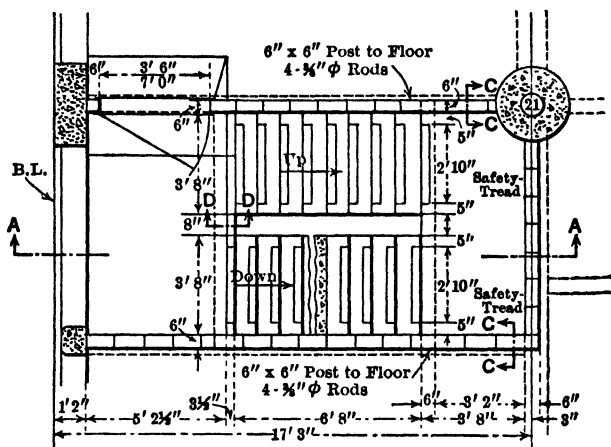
Structural Design of Reinforced-Concrete Stairs. Plan
